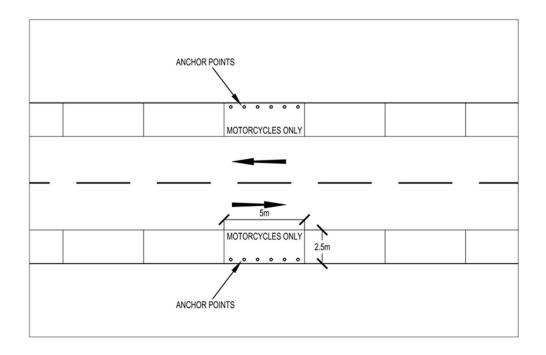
Motorcycle parking with surface mounted anchor points
